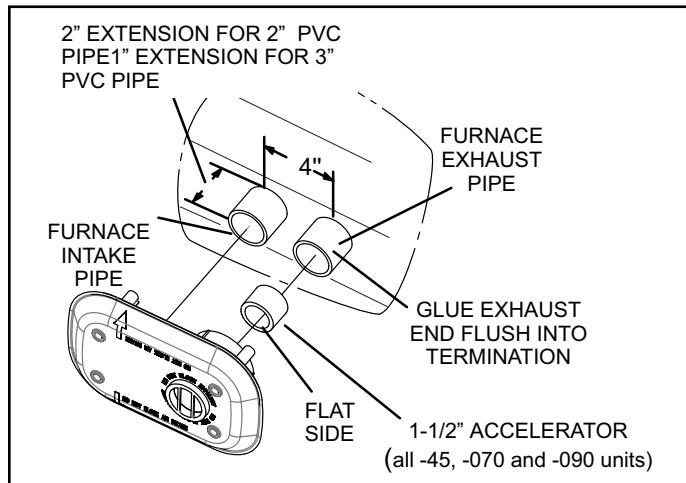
Exiting Exhaust and Intake Vent (no common pressure zone)
